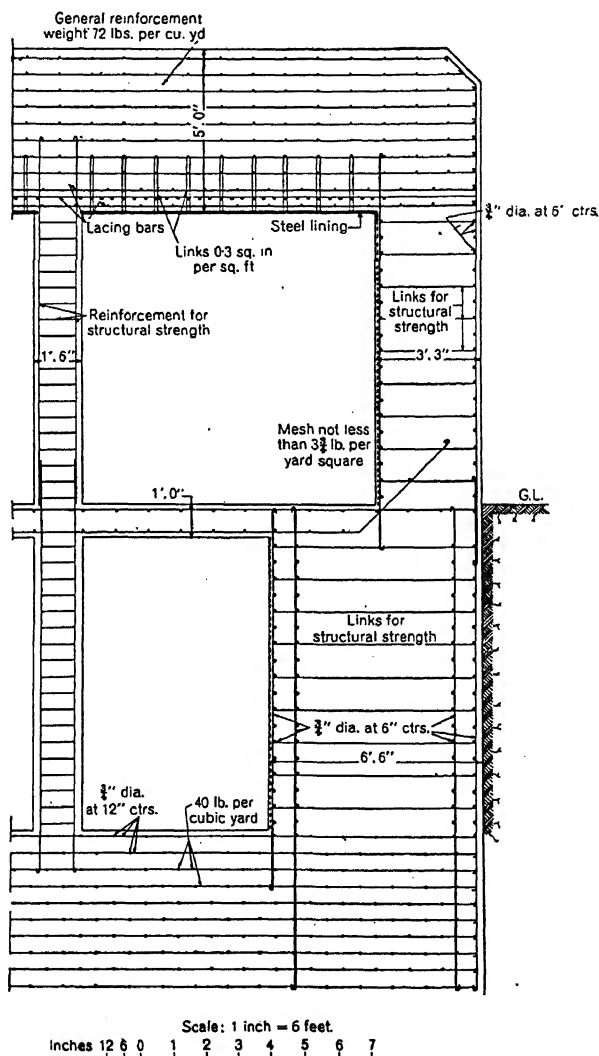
Showing details of the steel reinforcement of the roof and side walls of bomb-proof shelter, giving Class 6 protection.
